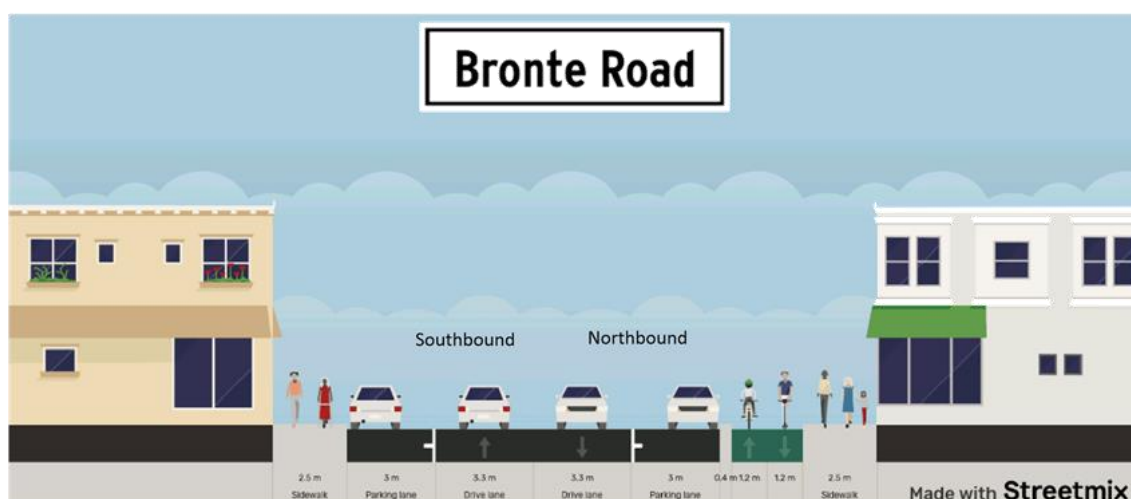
Cross Section of Proposed Bronte Road (239 Bronte Road)
